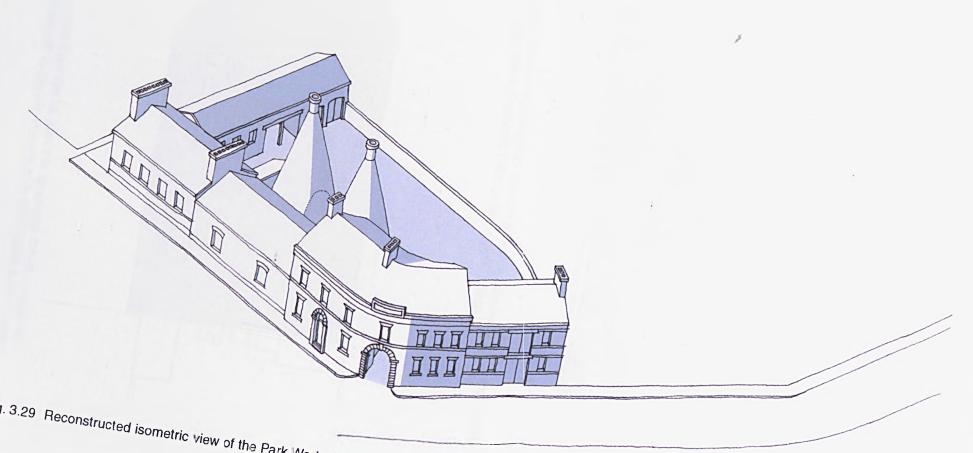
Reconstructed isometric view of the Park Works in 1834, scale 1:500 (author).
